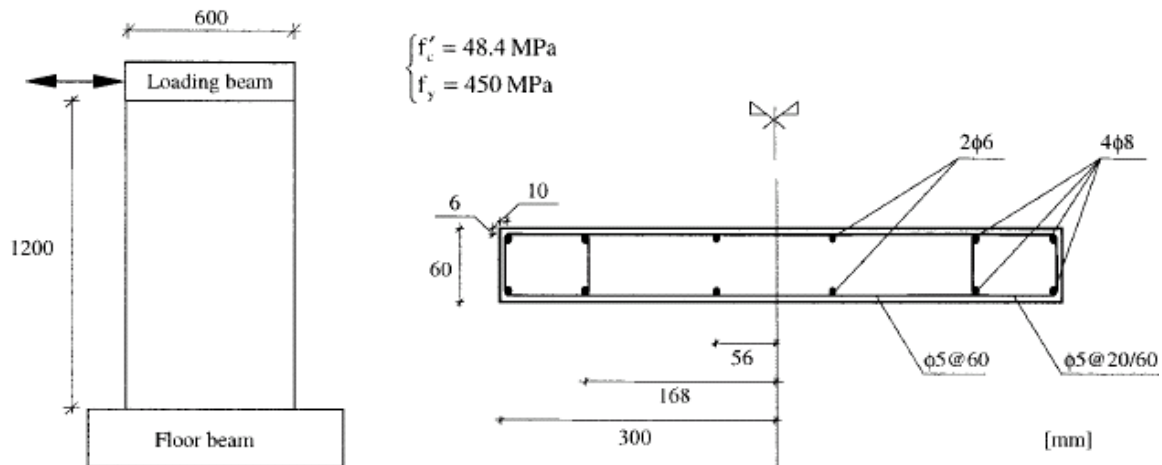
Elevation and cross-section of the specimen (Elnashai and Pinho 1998)
